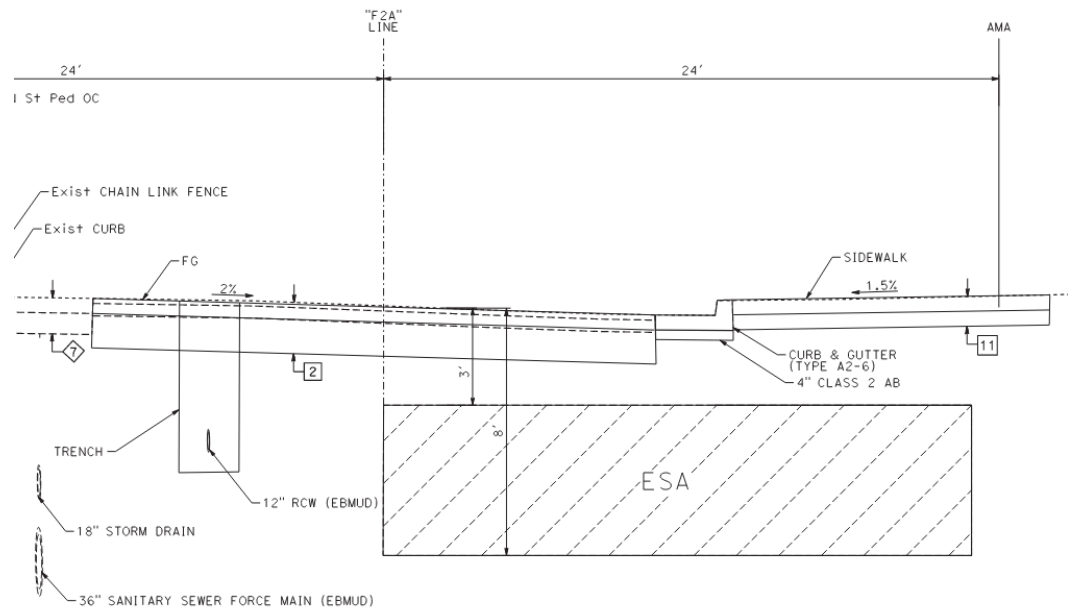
CONSTRUCTION DETAILS SHEET C-79 Excerpt
